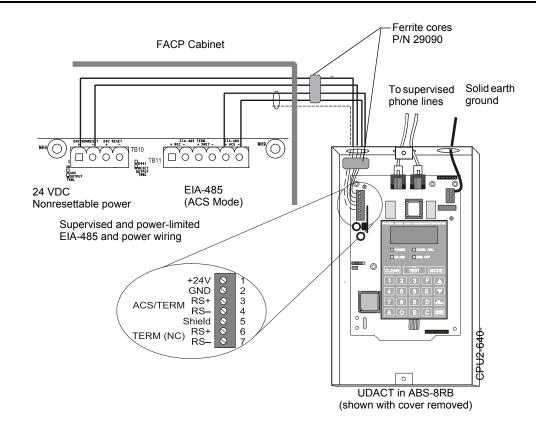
Typical Wiring Diagram for a Central Station Fire Alarm System
